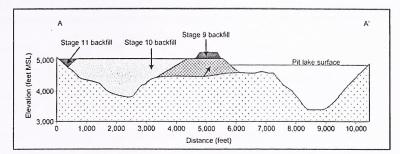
Stage 11 Cross Section A to A' through Pipeline/South Pipeline Open Pit
